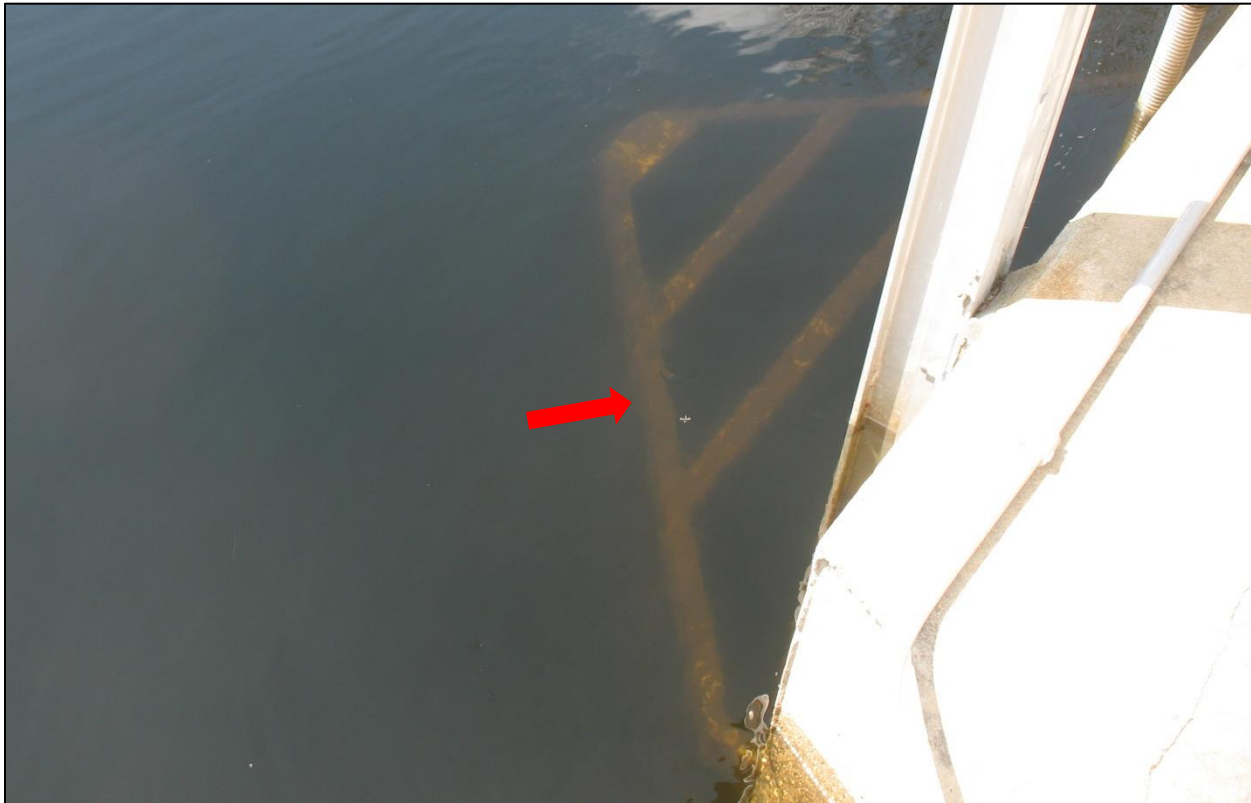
Central Sluice: Submerged Gate Trashrack Installed in 2014.
